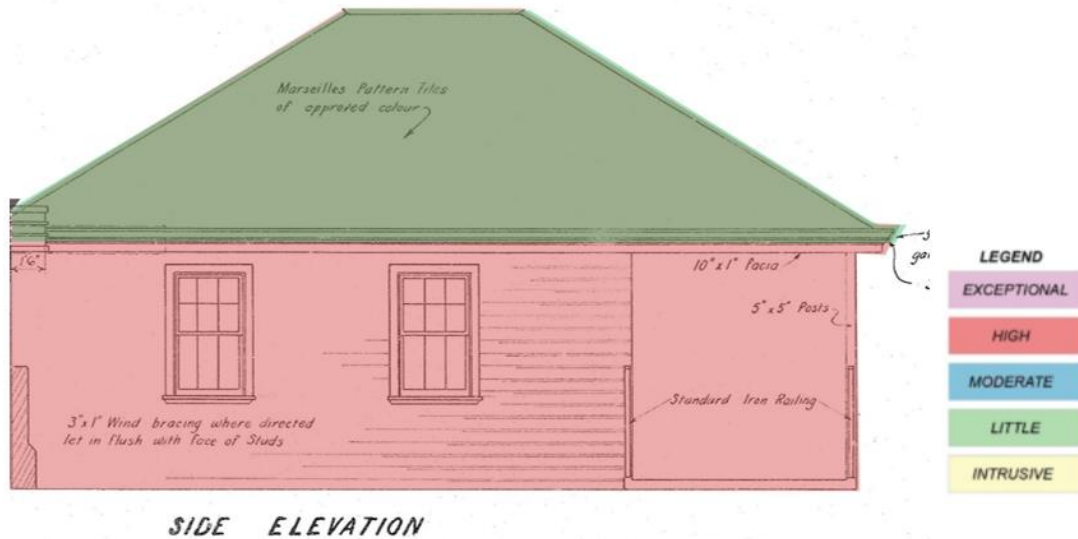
Element gradings of a section through the Denistone Station overhead booking office, view north-west towards the north-western end of the building (Source: RailCorp in Arcilla, Gupta and Binkhorst 2019. p. 17, additional assessment by Artefact 2021)
